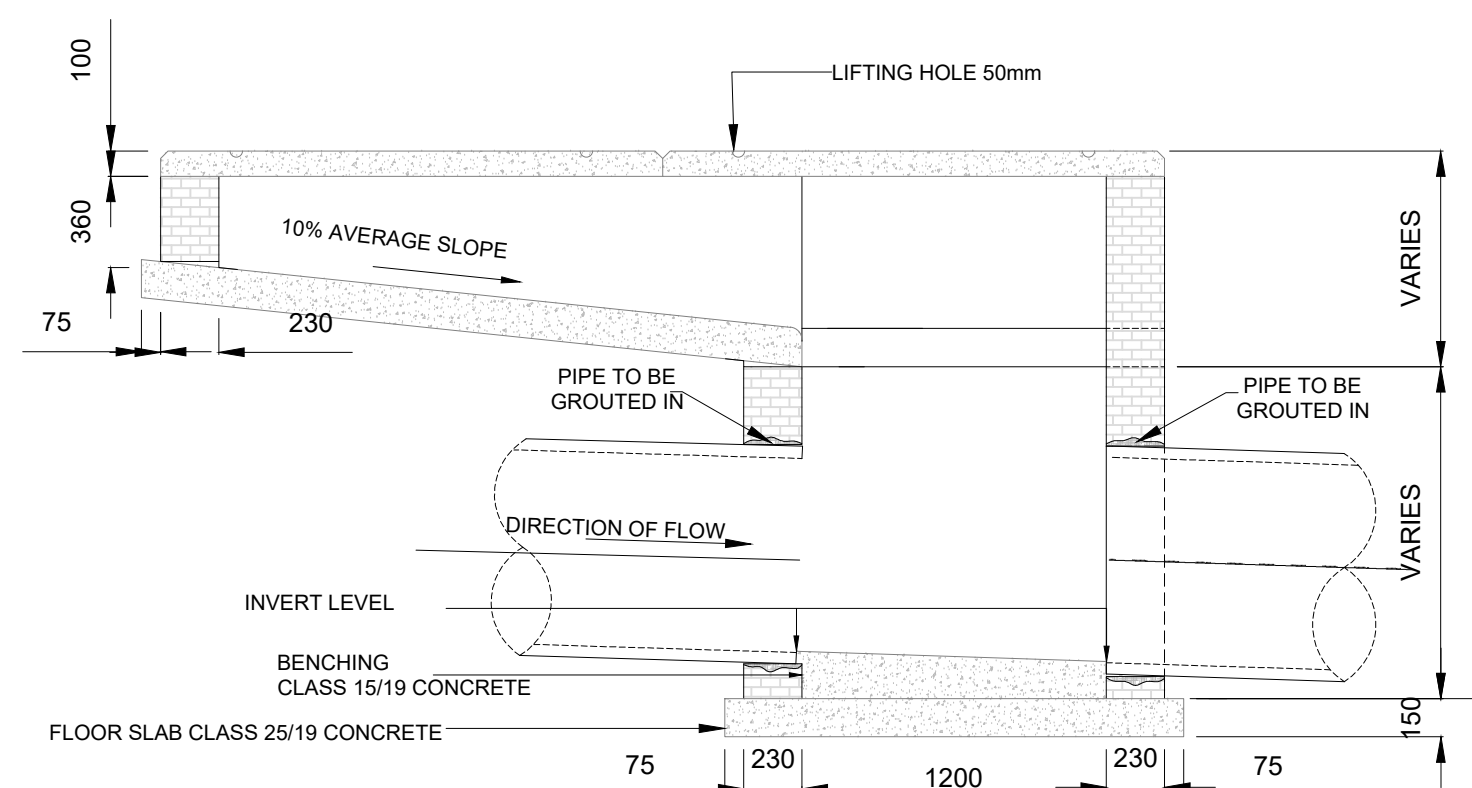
DETAIL C: TYPICAL CROSS SECTIONS " REF DETAIL B)
